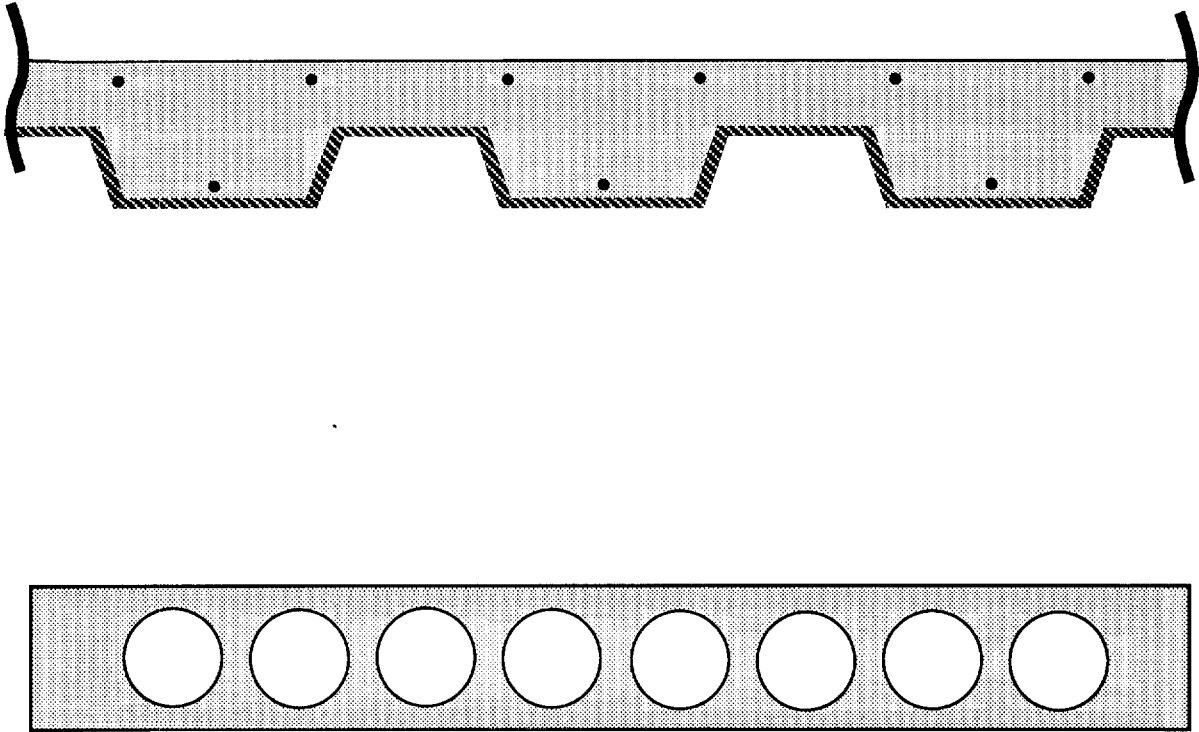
Sketch of examples of barrier/partition design where use of a one-dimensional thermal analysis may not lead to reliable results; top: composite concrete slabs with profiled steel sheets (metal deck floors); bottom: uniform-thickness concrete slabs with regularly-spaced inclusions.
